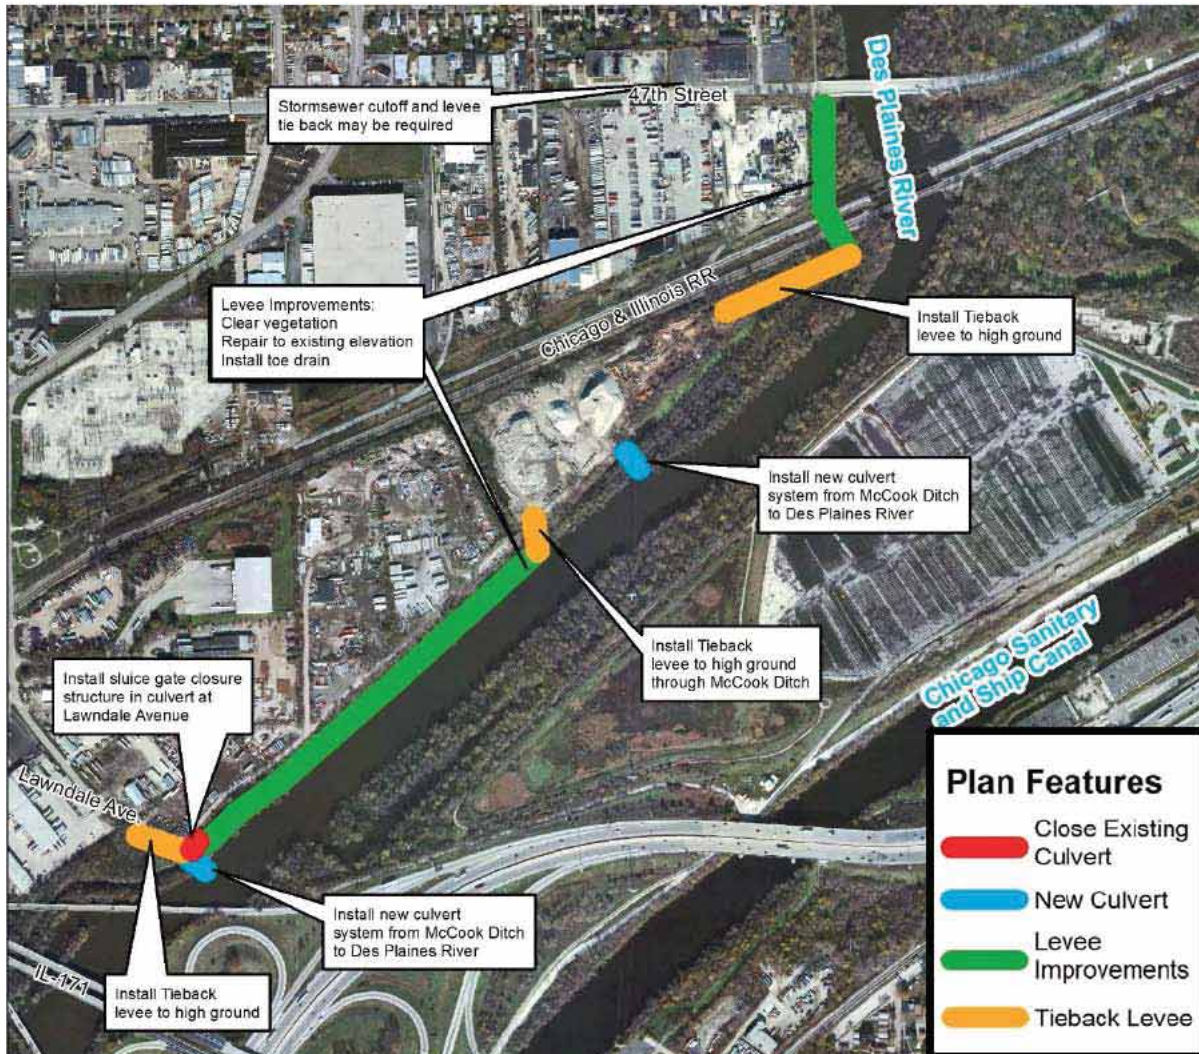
Alternative 3A – McCook Levee Segmented Repair Schematic
